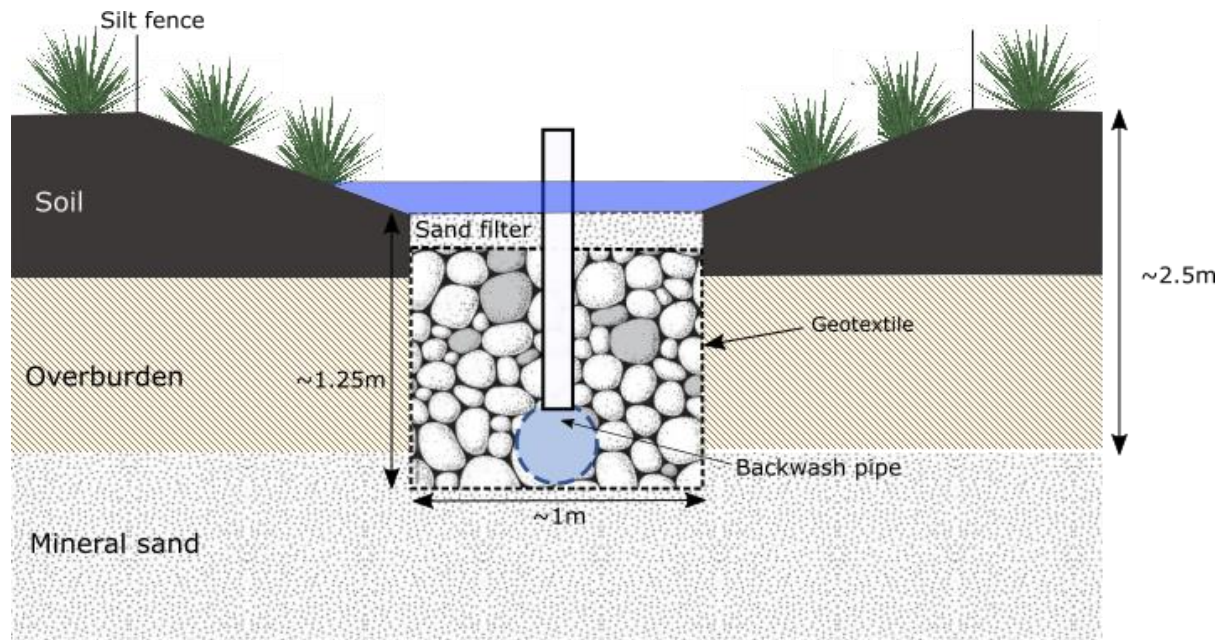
Schematic of infiltration trench showing trench void, gravel backfill and perforated PVC pipe
